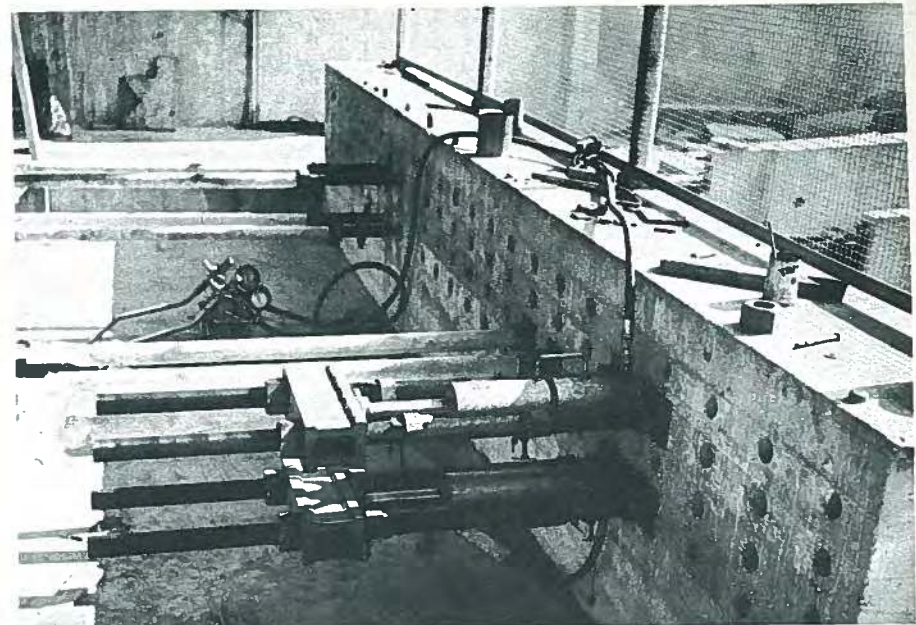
For prestressing the wires, hydraulic jacks act against heavy reinforced concrete abutments.
